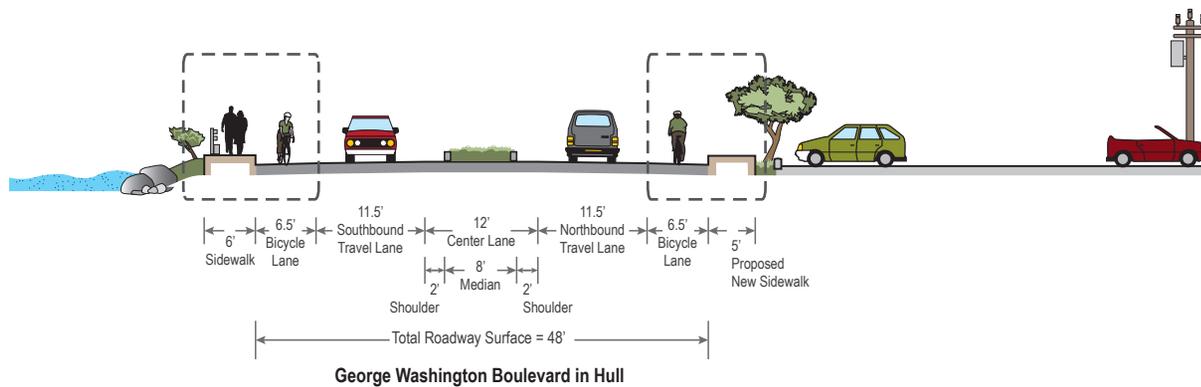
Proposed Long-Term Improvement Roadway Cross-Sections
